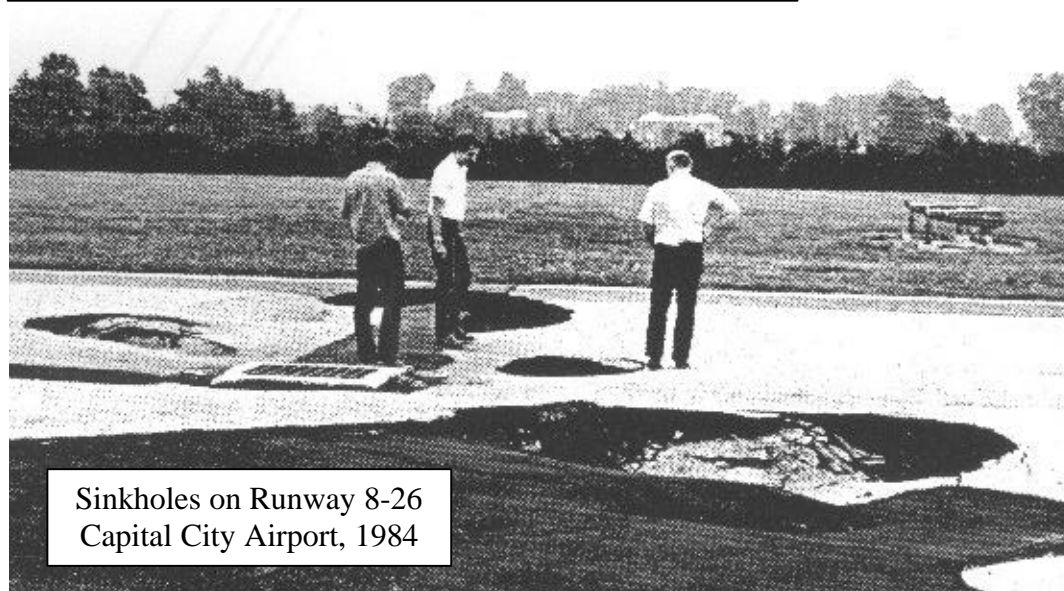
OTHER PAVEMENT FAILURES
